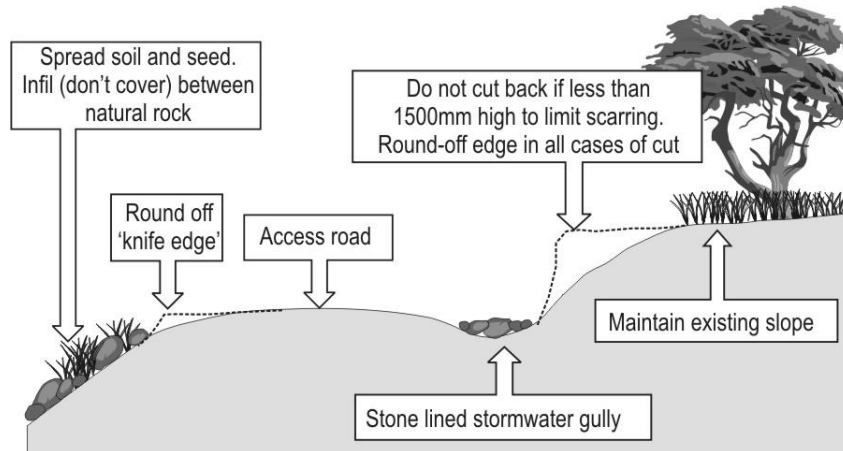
Section through a typical cut and fill scenario for a road. Diagram as per DWA
